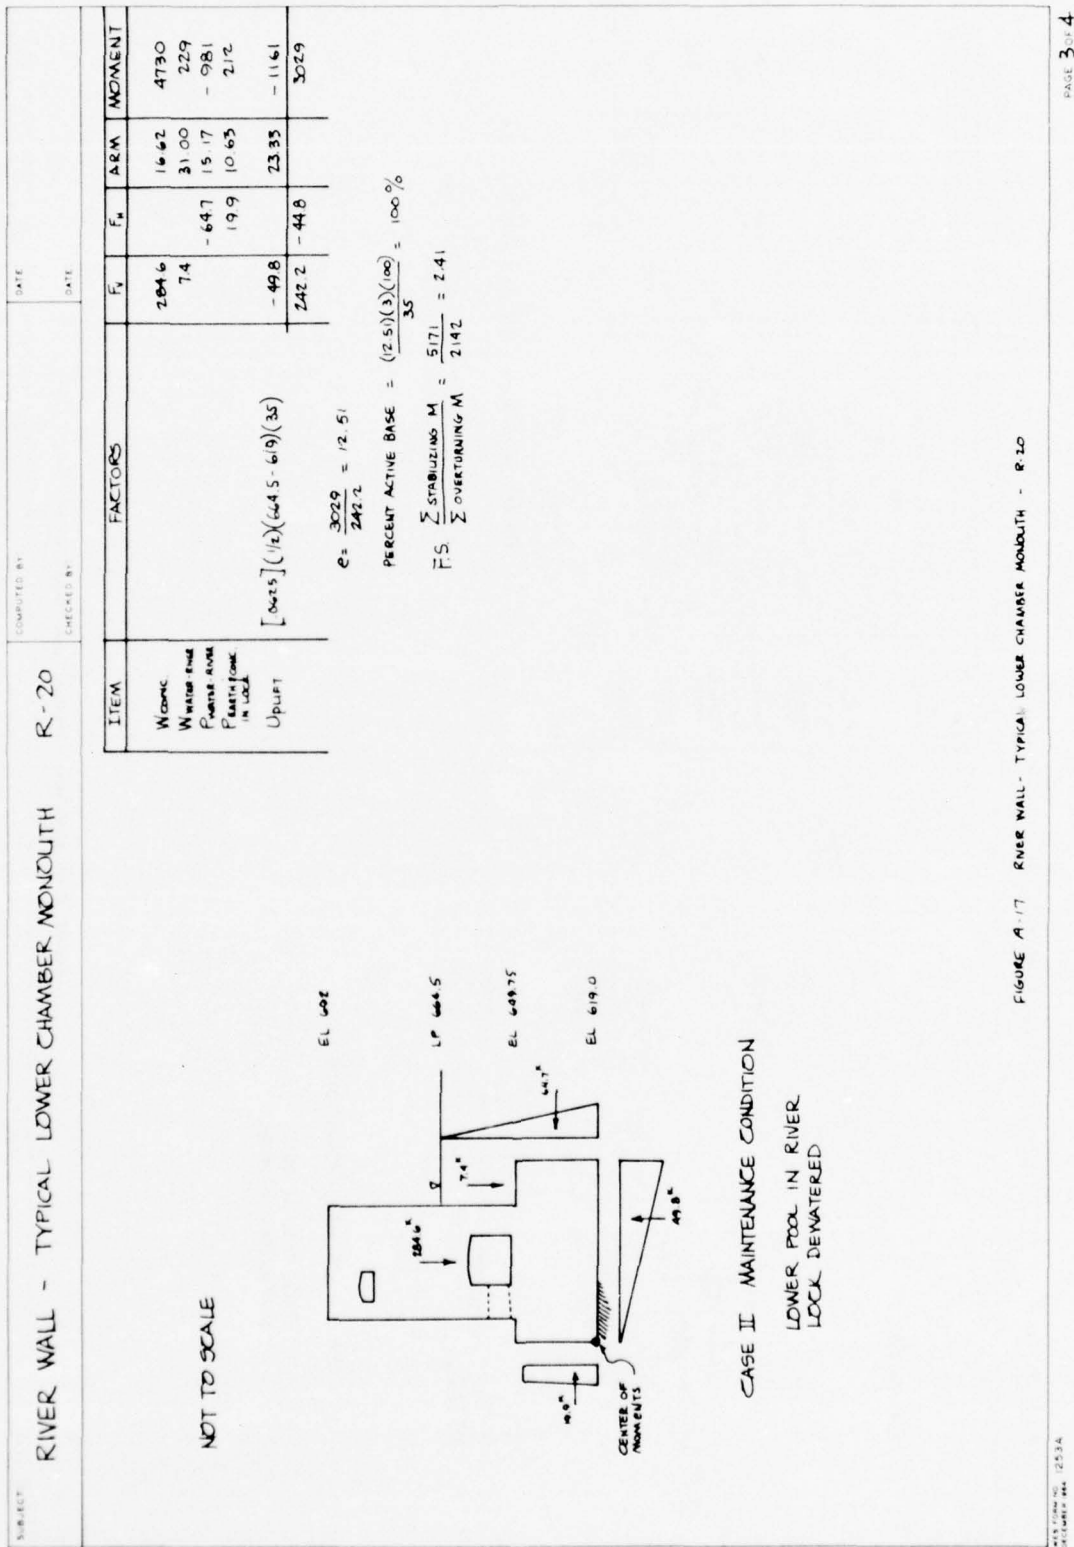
RIVER WALL - TYPICAL LOWER CHAMBER MONOLITH R-20
